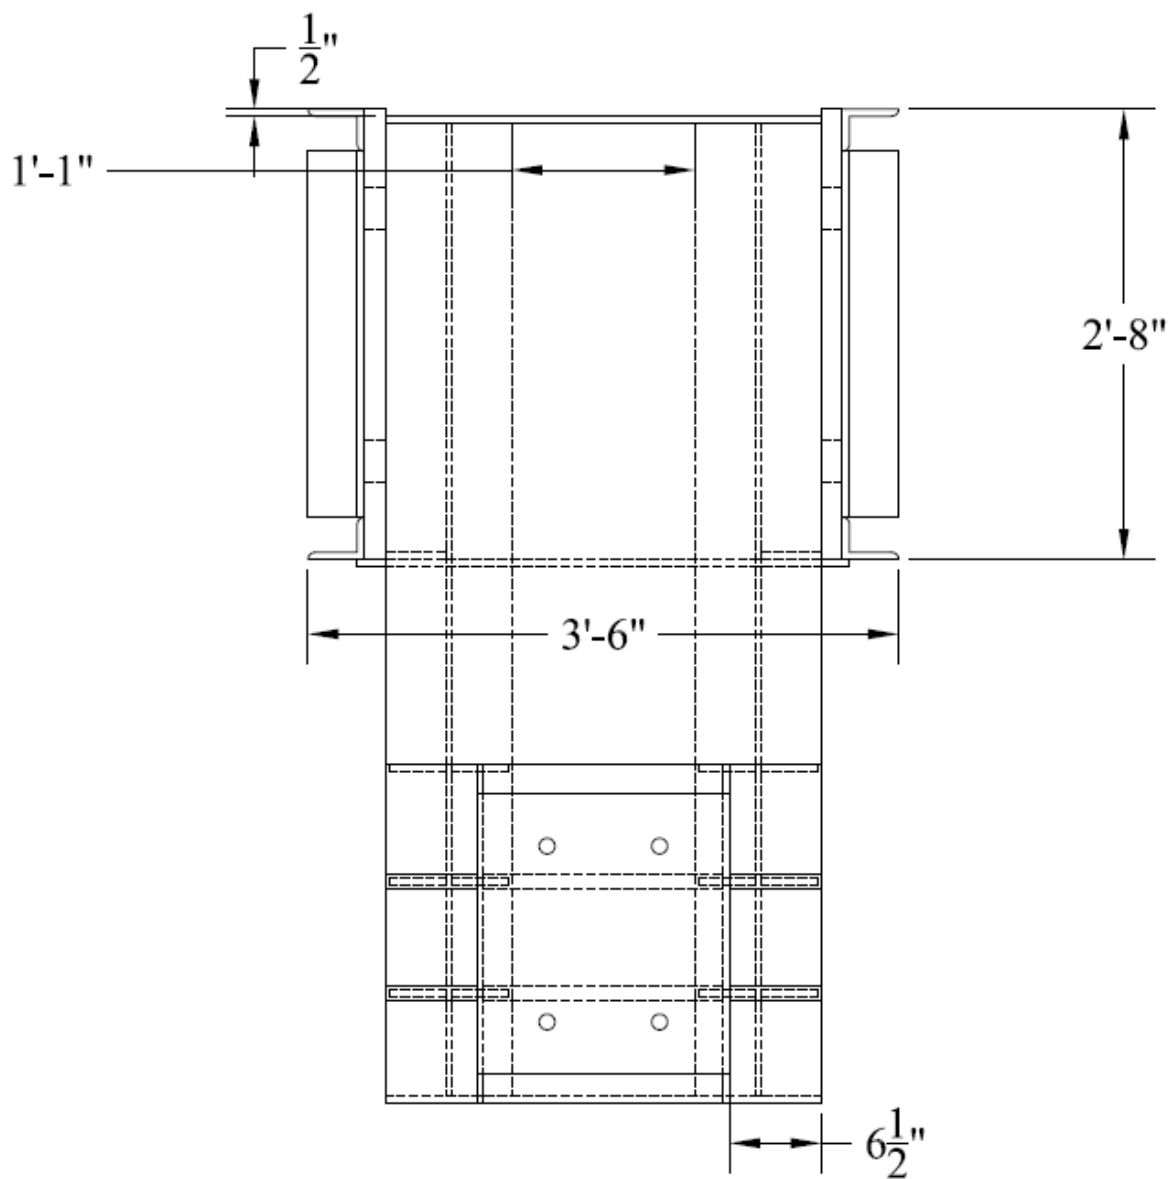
Loading Frame Side View (2) (1 in. = 25.4 mm)
